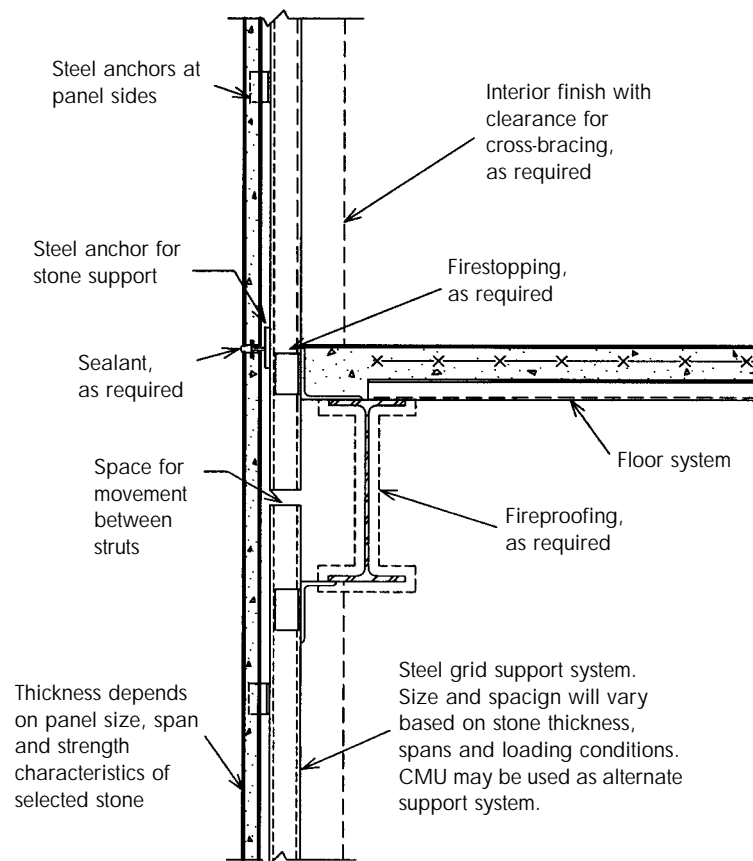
## DETAILING CONSIDERATIONS FOR THIN STONE VENEER PANELS
